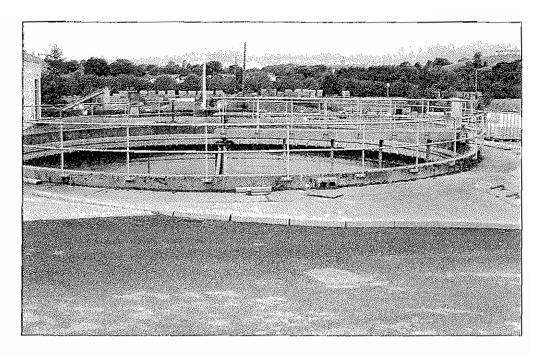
Existing storm water tank with concrete surrounds, looking west.
